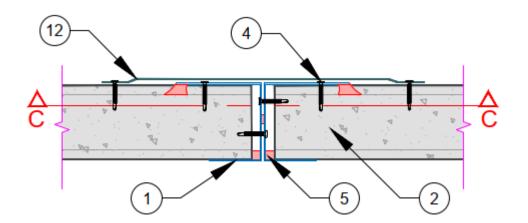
Single void box riser – mid-wall connection when span is 6 m (metal flashing on unexposed side)
